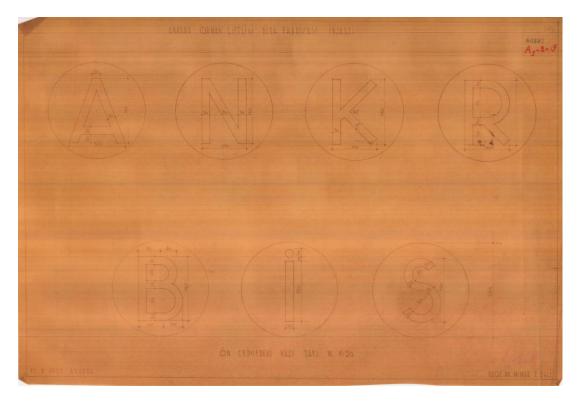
Detail drawing of the bronze writing on the north façade of the beer settling building, Ernst Egli, 1937 (Source: TTA Archive)
